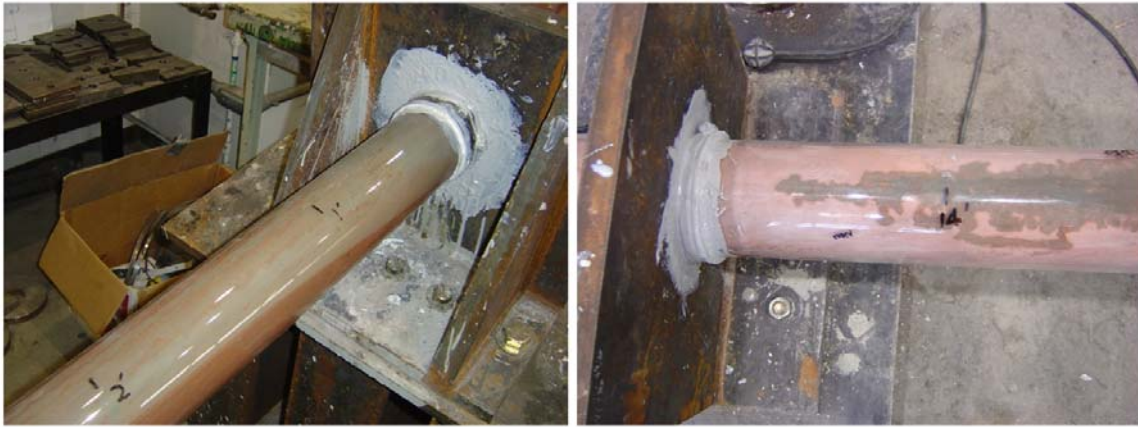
Repair Grouted Ducts of Specimen PVG-C1-2.
